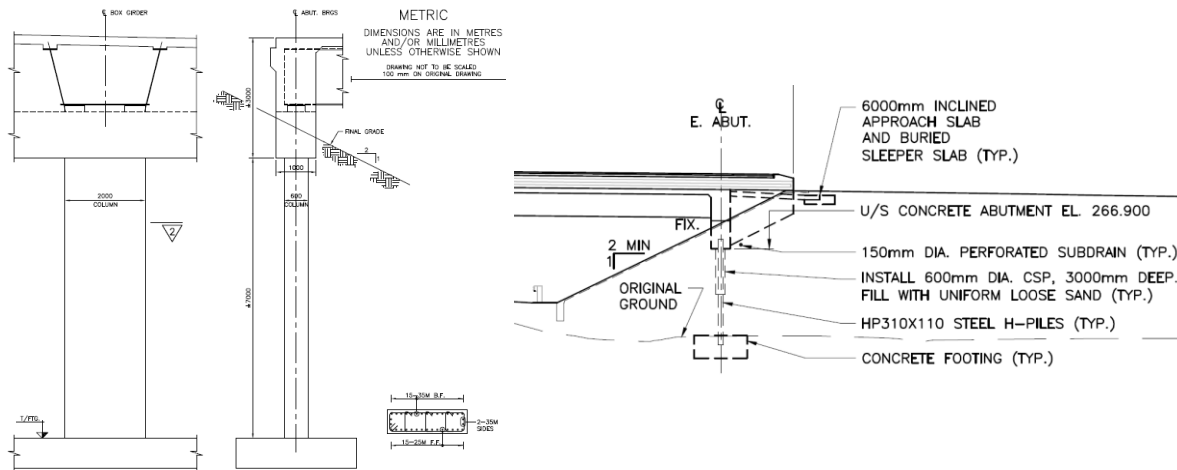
Examples of integral abutments on shallow foundations with an abutment stem supported on a column built up from the spread footing
